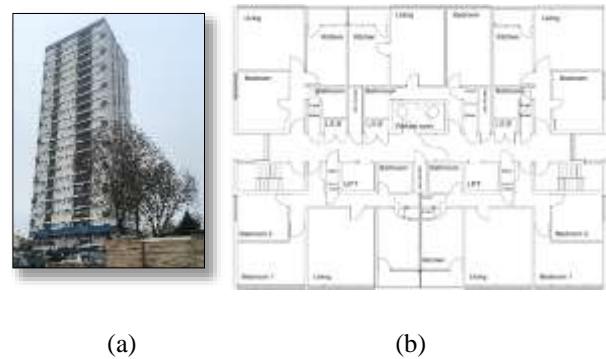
Case study (a) and the typical floor plan (b) (Newham Council, 2007)
